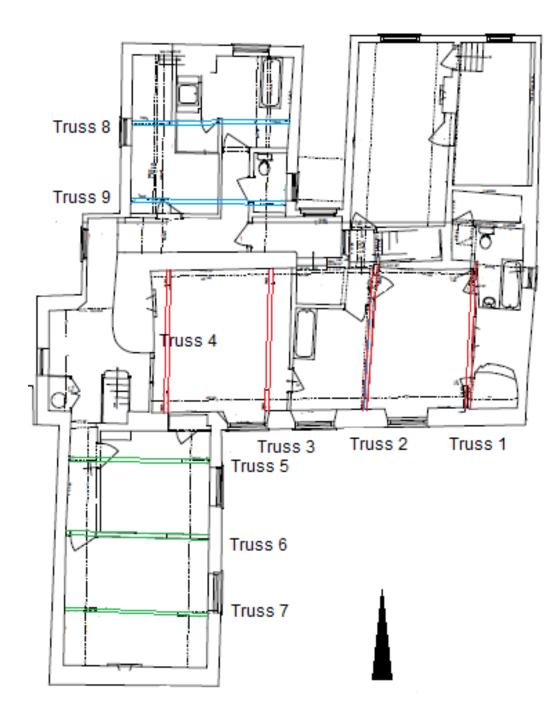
First-floor plan, showing truss location (Quentin Alder Architects)
